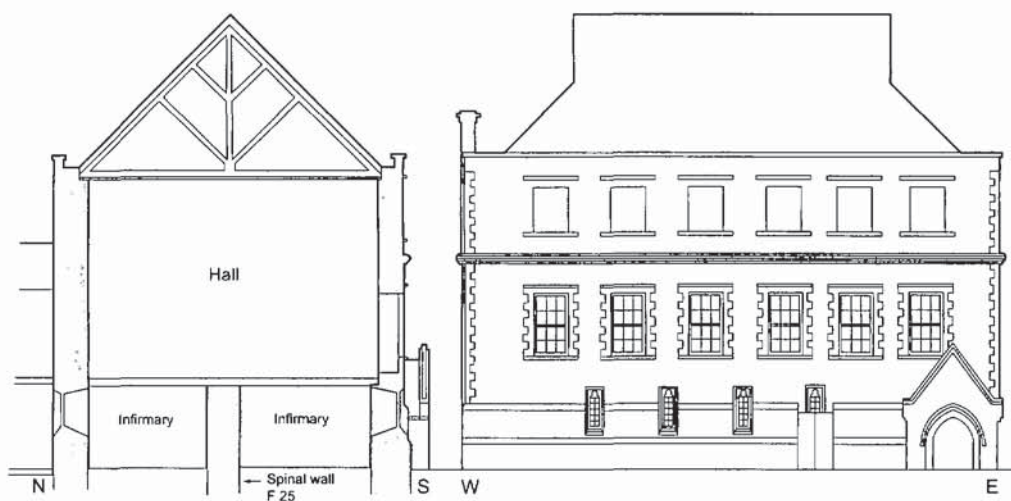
St John's Hospital (a) cross section through building (b) southern elevation
